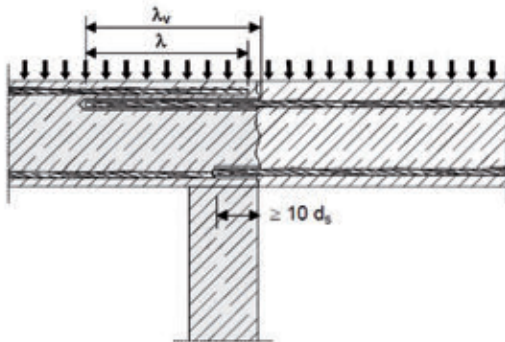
Overlap joint for rebar connections of slabs and beams
